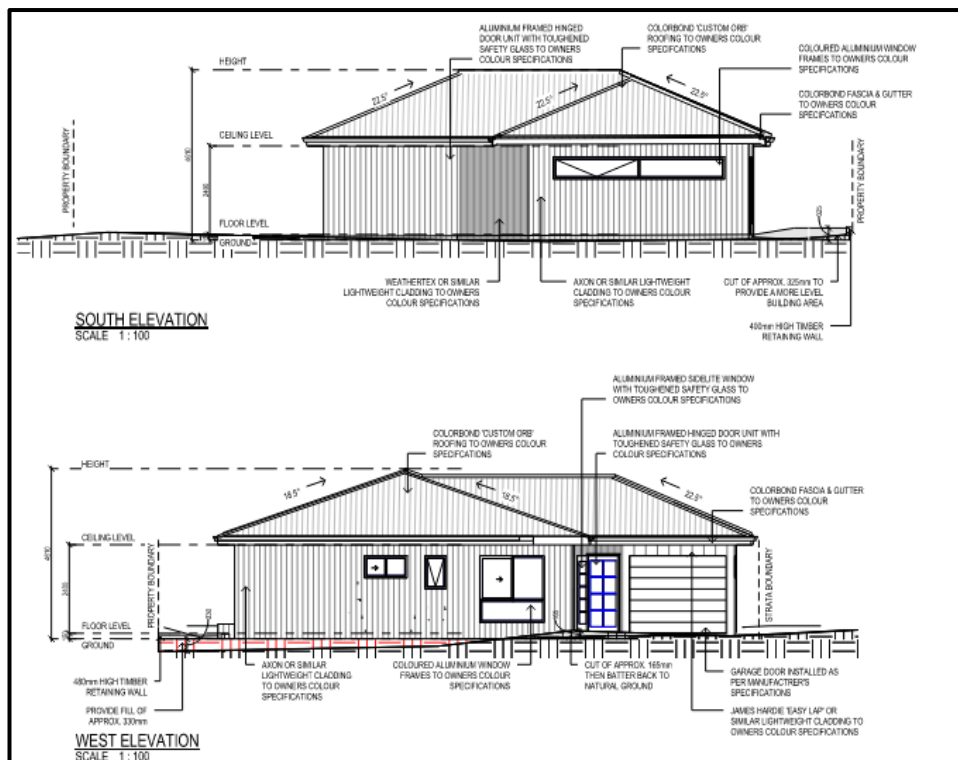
Excerpt of plans submitted showing the south and west elevation.
